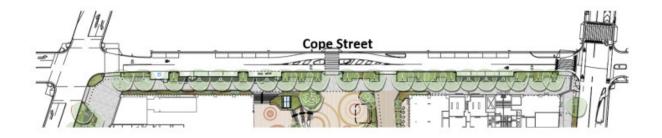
Plan view showing the design concept for Cope Street with narrowed carriageway and landscaped footpath.
